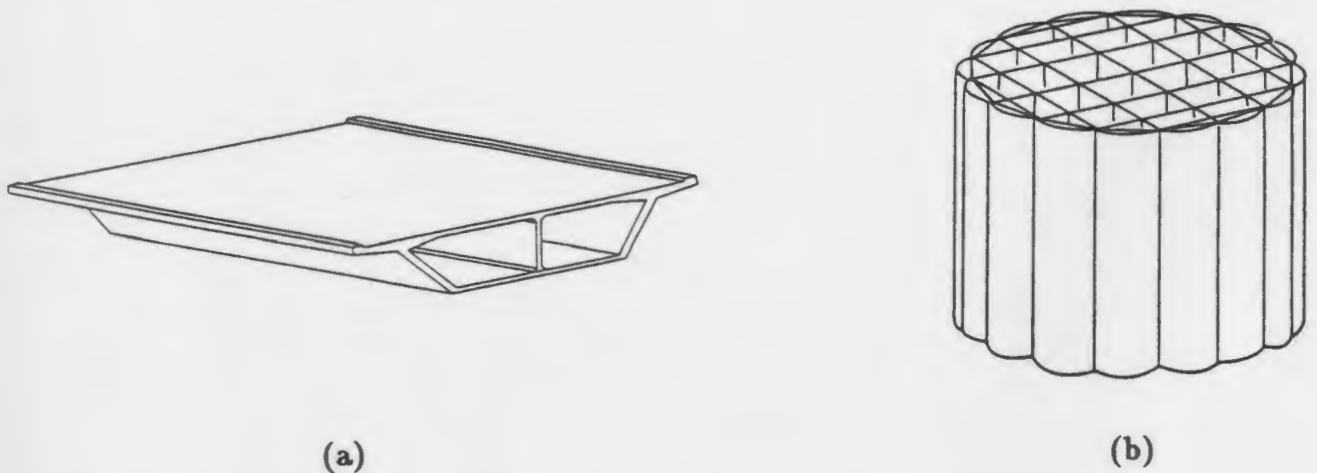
Examples of typical structural elements of high-strength concrete
